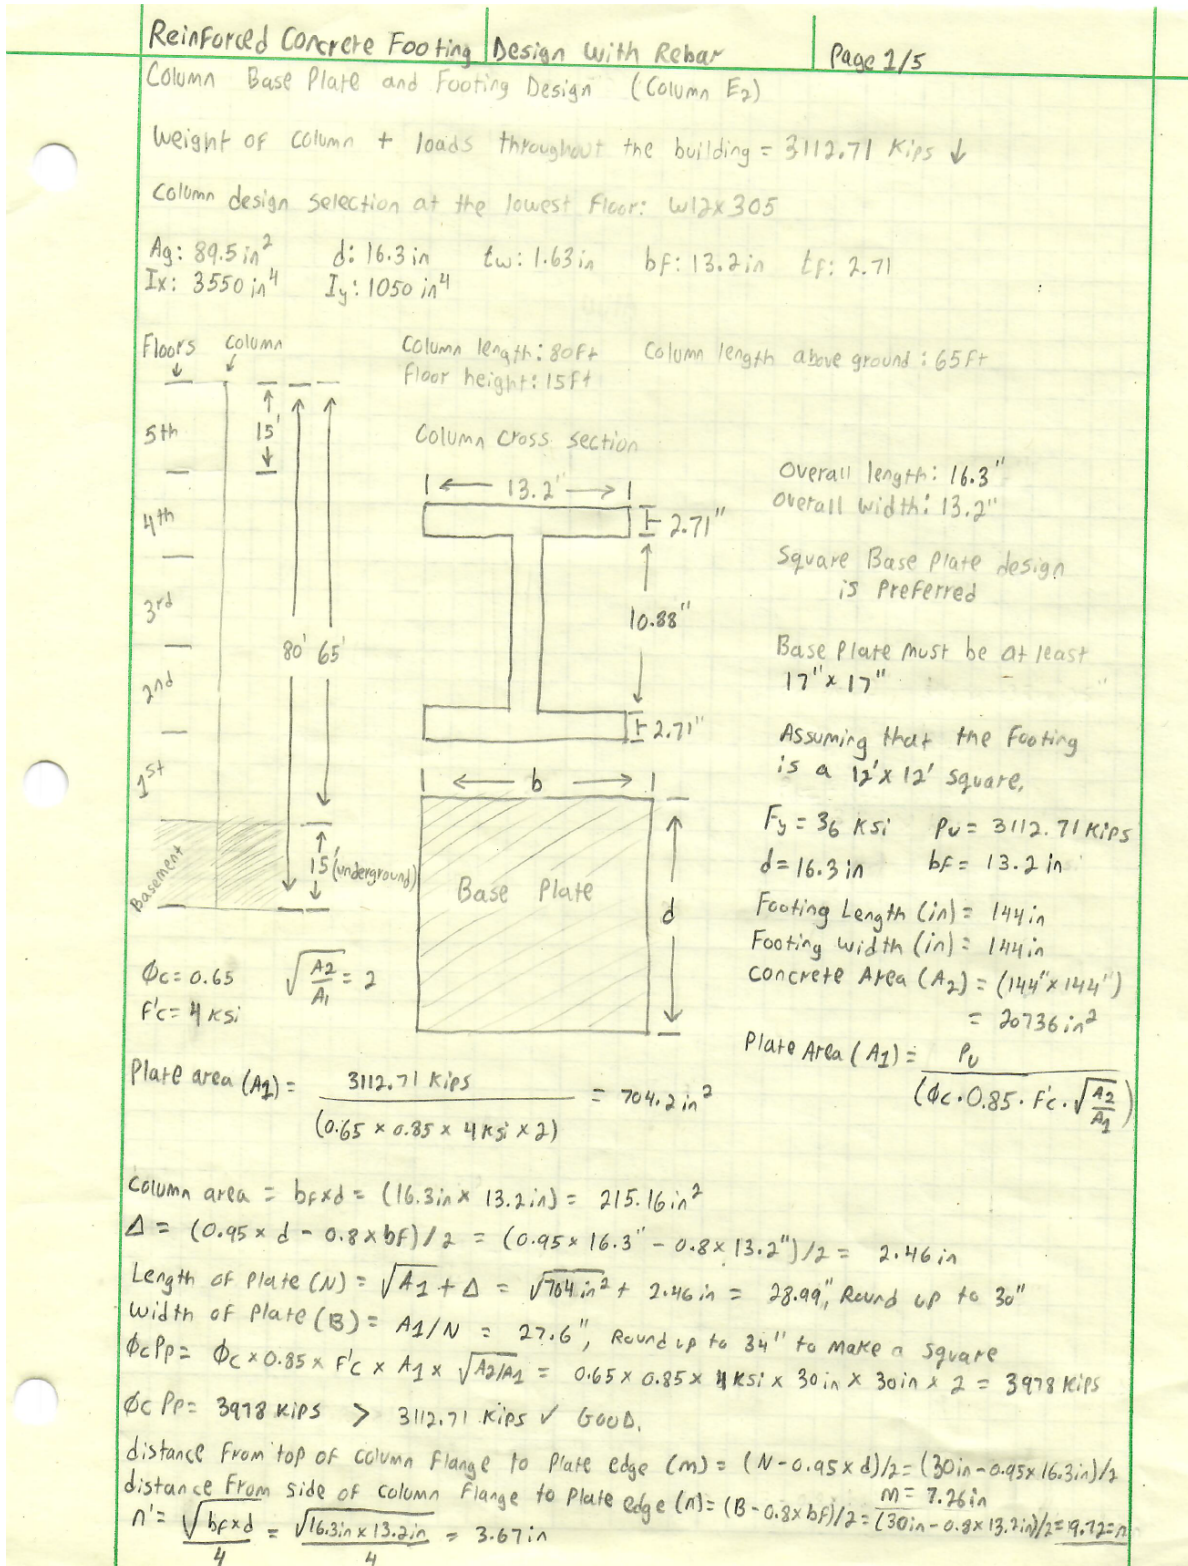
Column Footing Design Sample Calculation Page 1. Continued in Figures O.2-O.6
